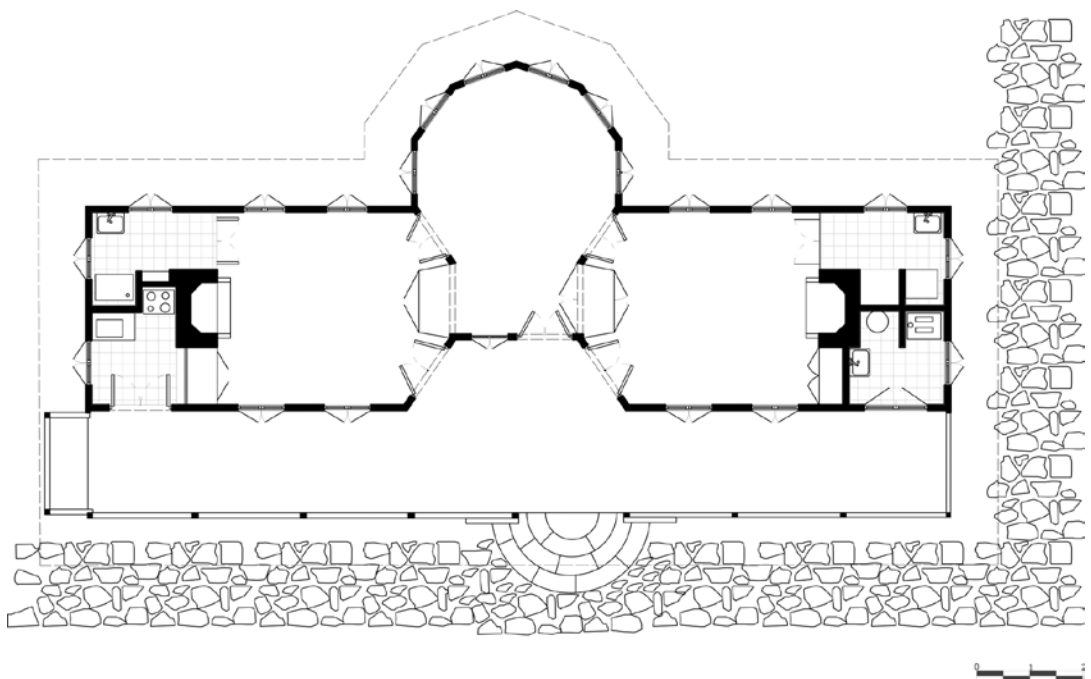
Plan of Nail Çakırhan House (Source: Author).
